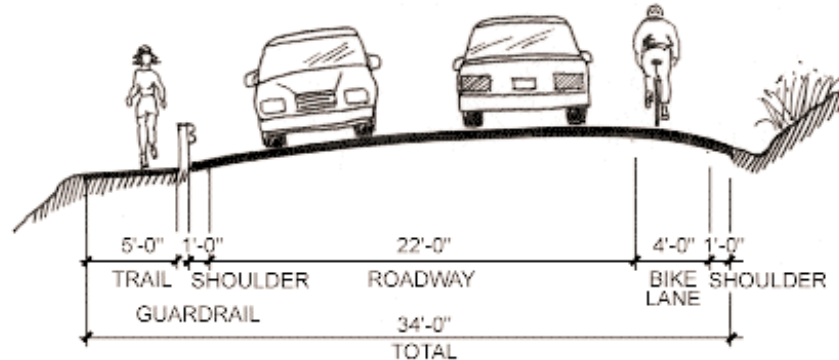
Proposed Lincoln Boulevard at Washington Boulevard
